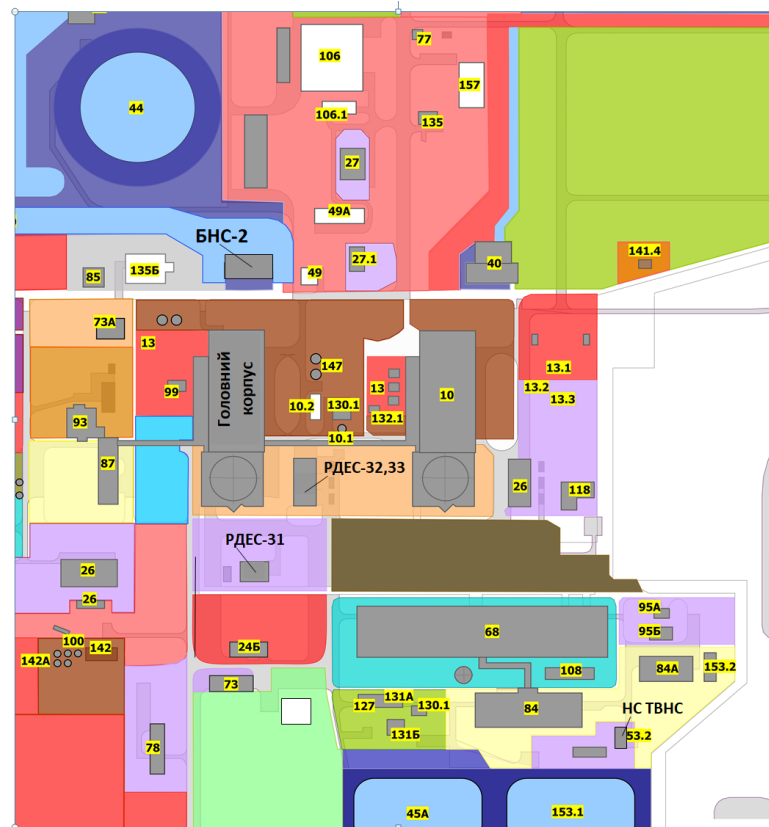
Layout of the main buildings of RNPP Unit 3
